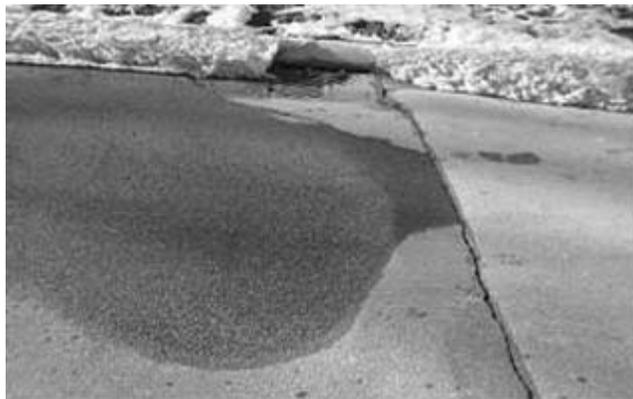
Water from melting snow readily enters pavement structure through a transverse crack.
